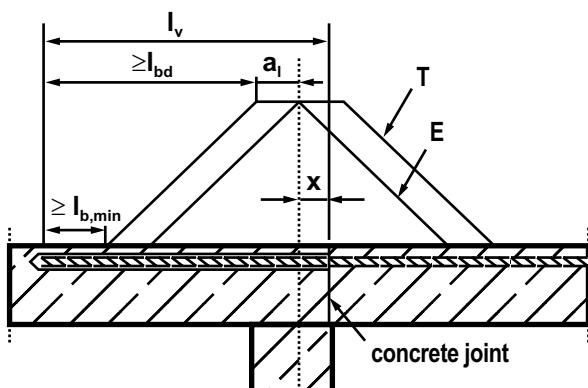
Overlap joint at a foundation of a column or wall where the rebar is stressed in tension
